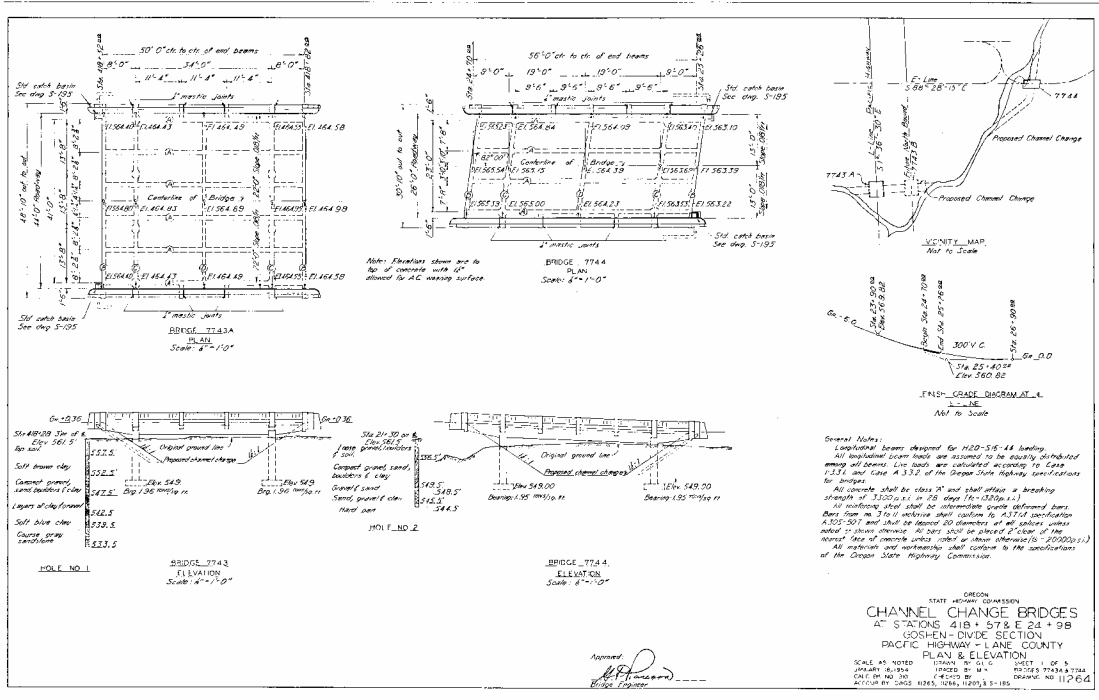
Overall view of bridge # 07743A (Drawing 11264).
